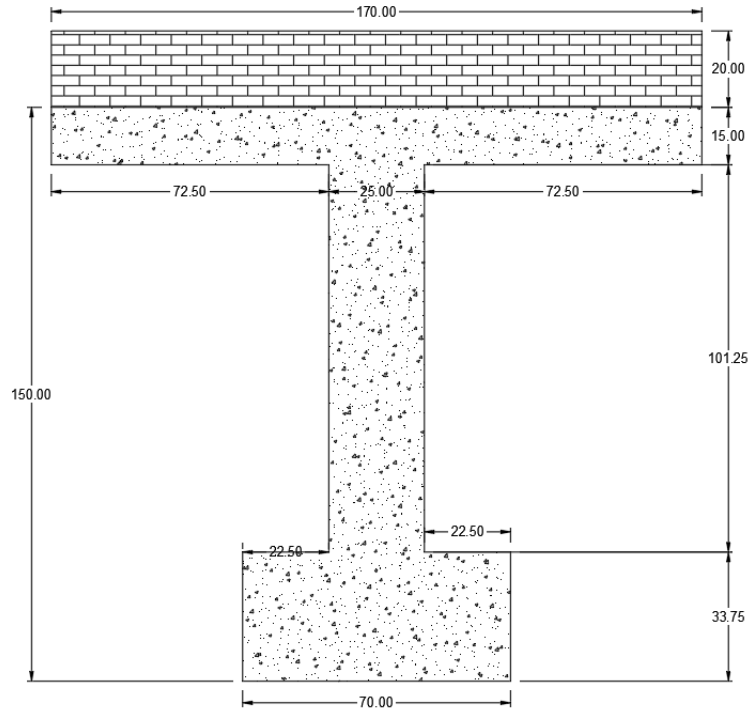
Cross-section of Prestressed Concrete Girder and Slab
